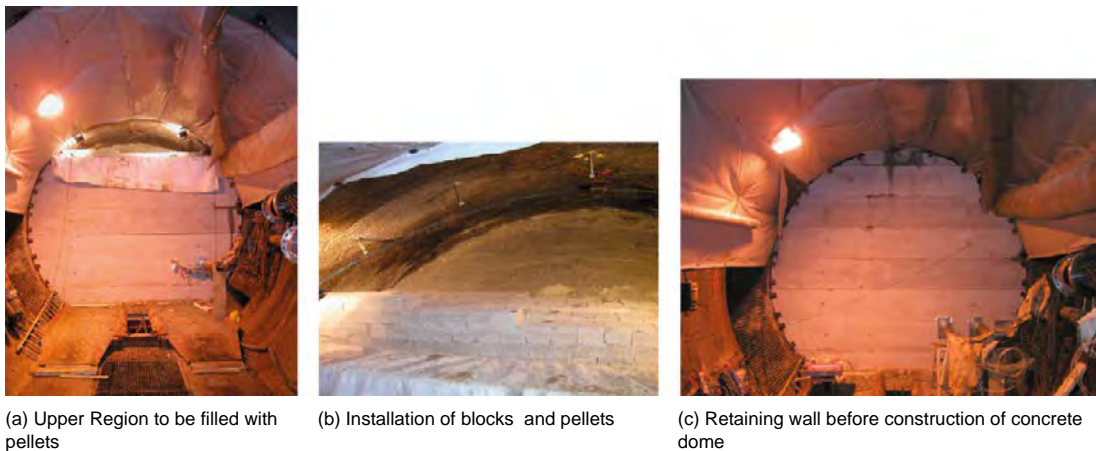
The retaining wall of the outer plug. (Figure 4-12 in Dixon et al. 2009.)
